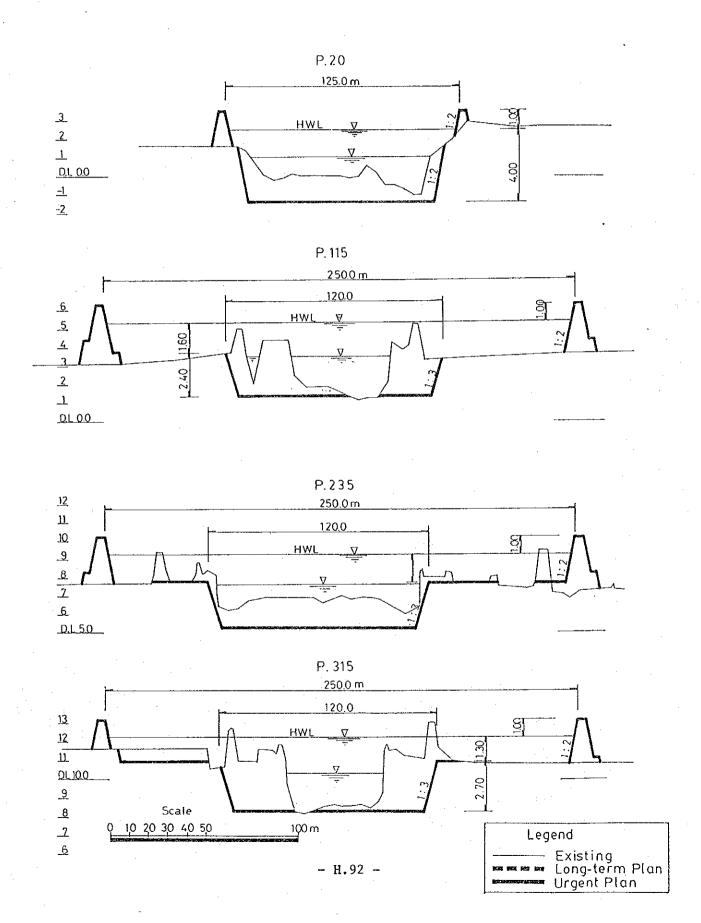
Proposed Long-Term Plan of Asahan and Silau Rivers (6/6)
